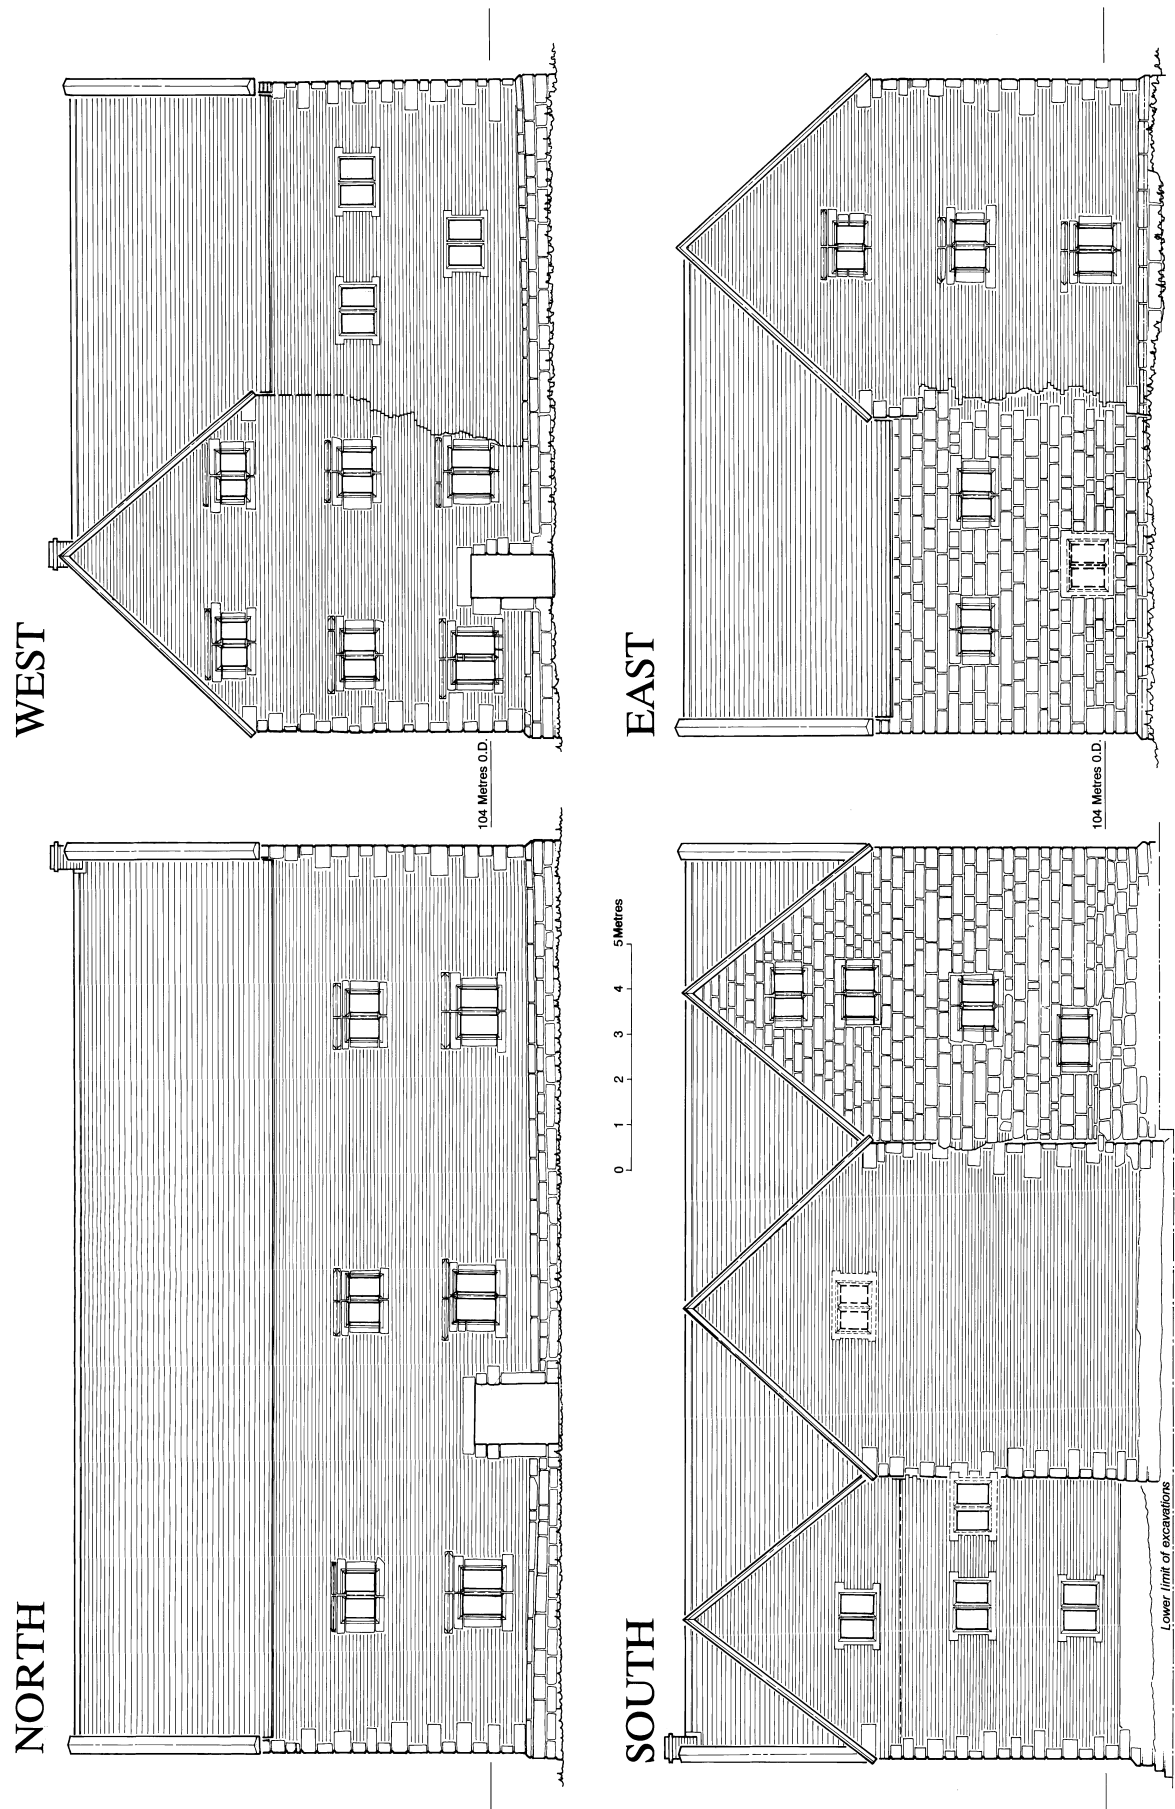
Madeley Court barn: external elevations, Phases 1 and 2 reconstruction.
